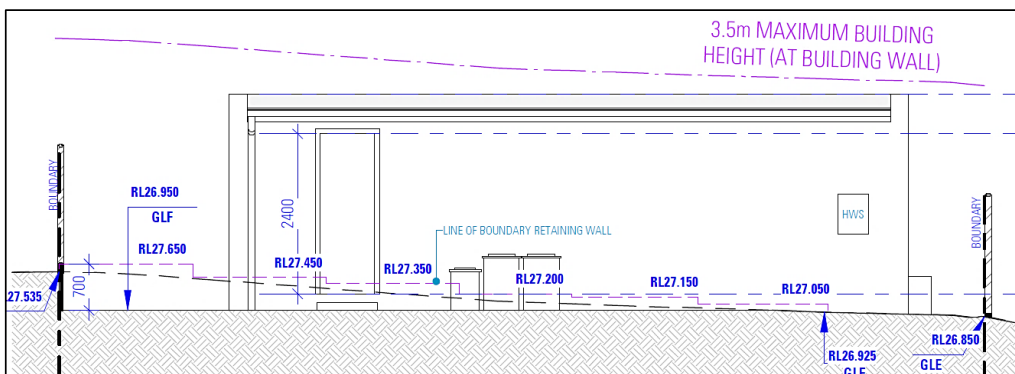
Proposed Eastern Elevation of the outbuilding fronting 7 Karuah Street
